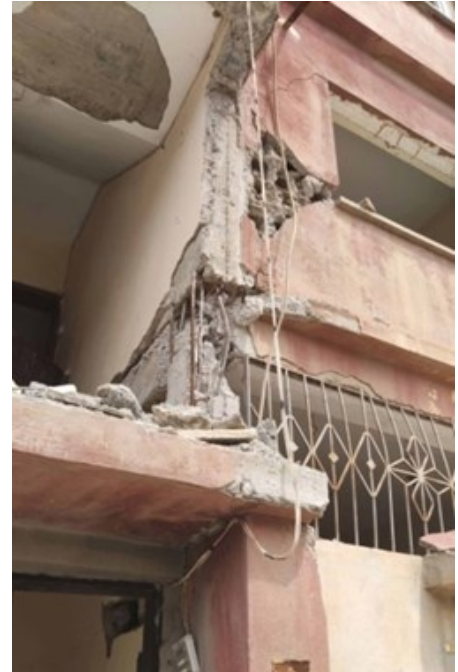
Damage in RC columns because of sparsely spaced stirrups and opening of ties, followed by buckling of the longitudinal reinforcement.
